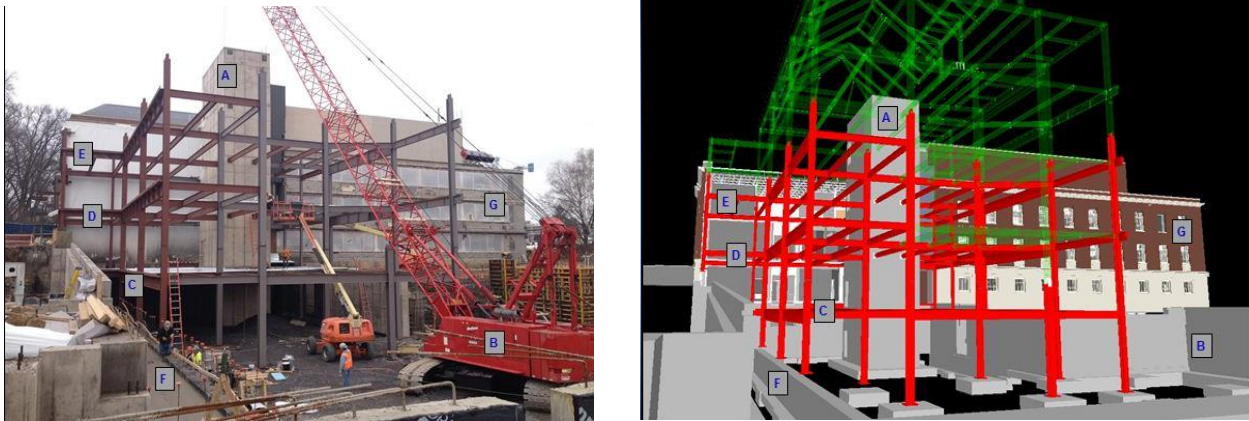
Stair A Installation with Steel Members Compared to BIM Model
